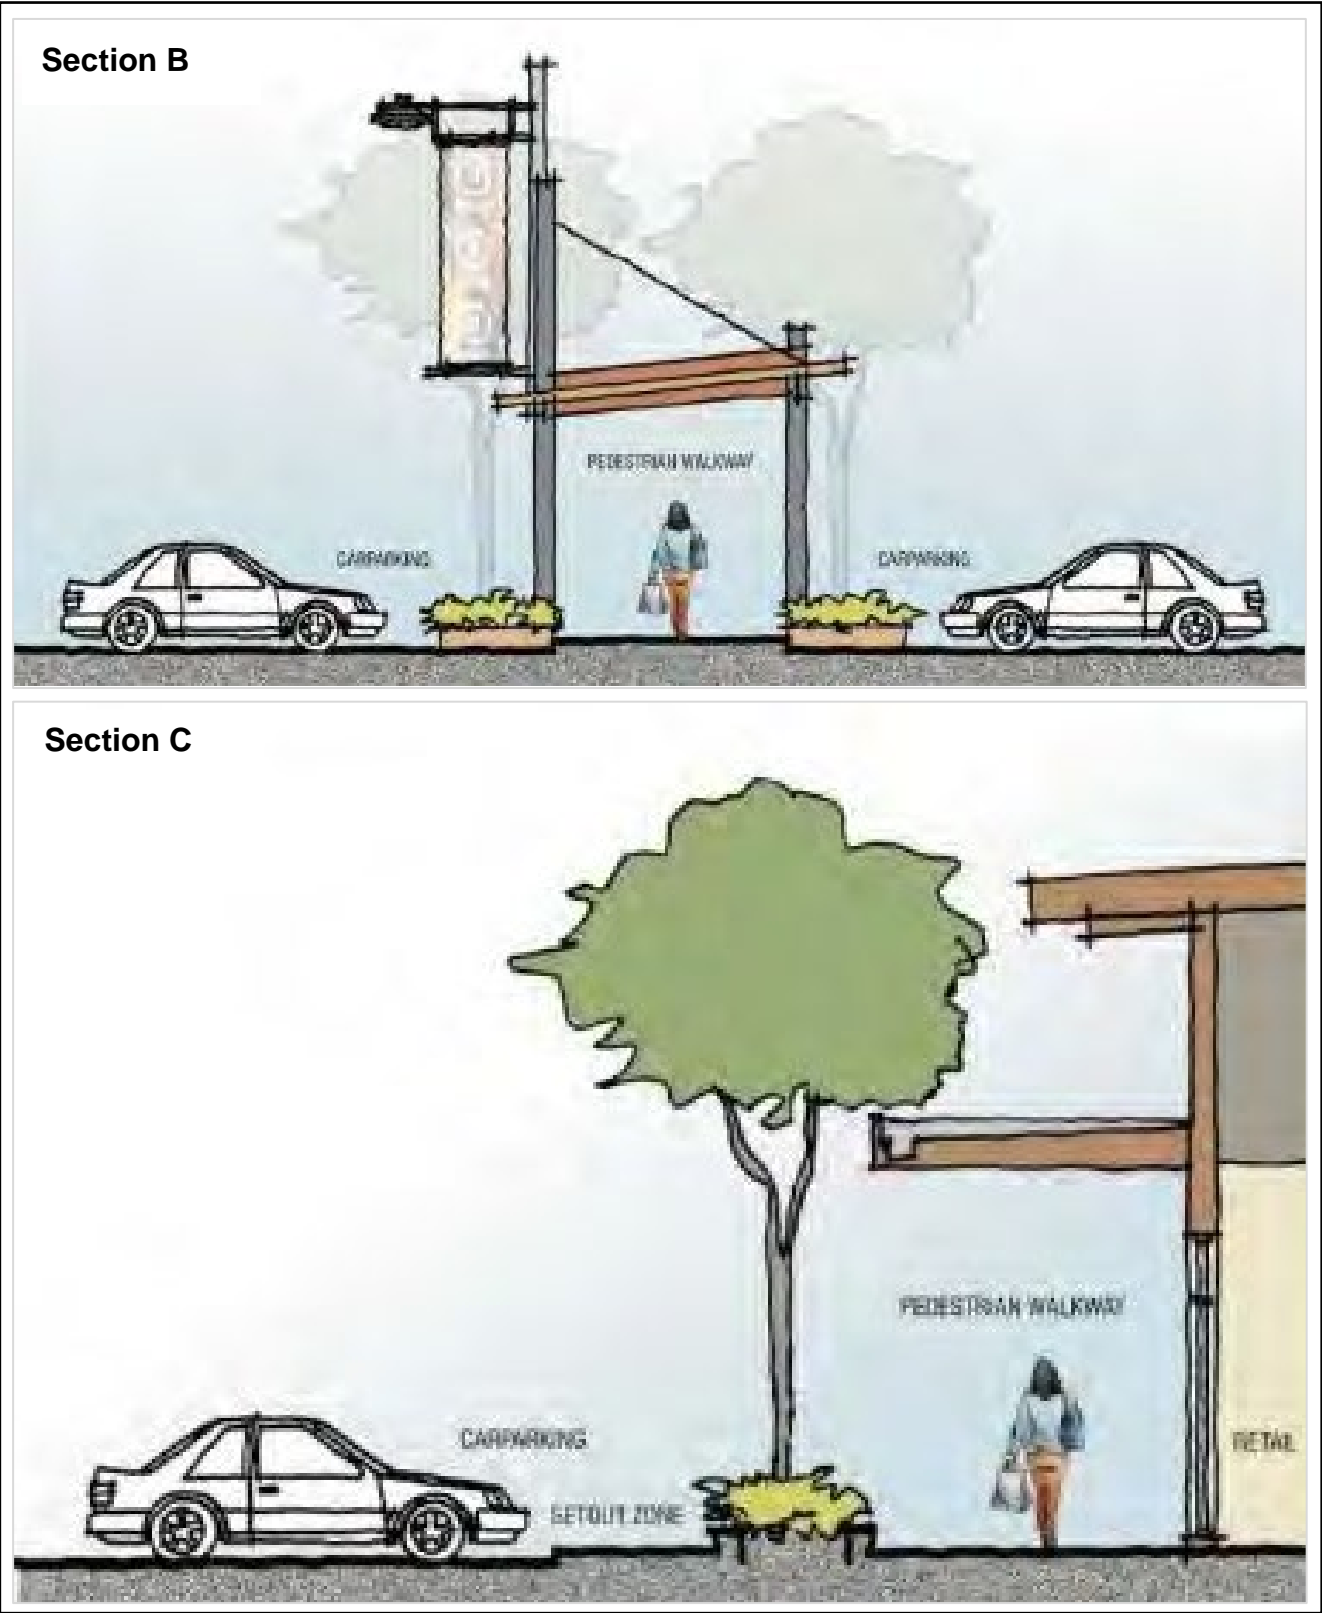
Built form sections plan. (Plans prepared by The Buchan Group)
